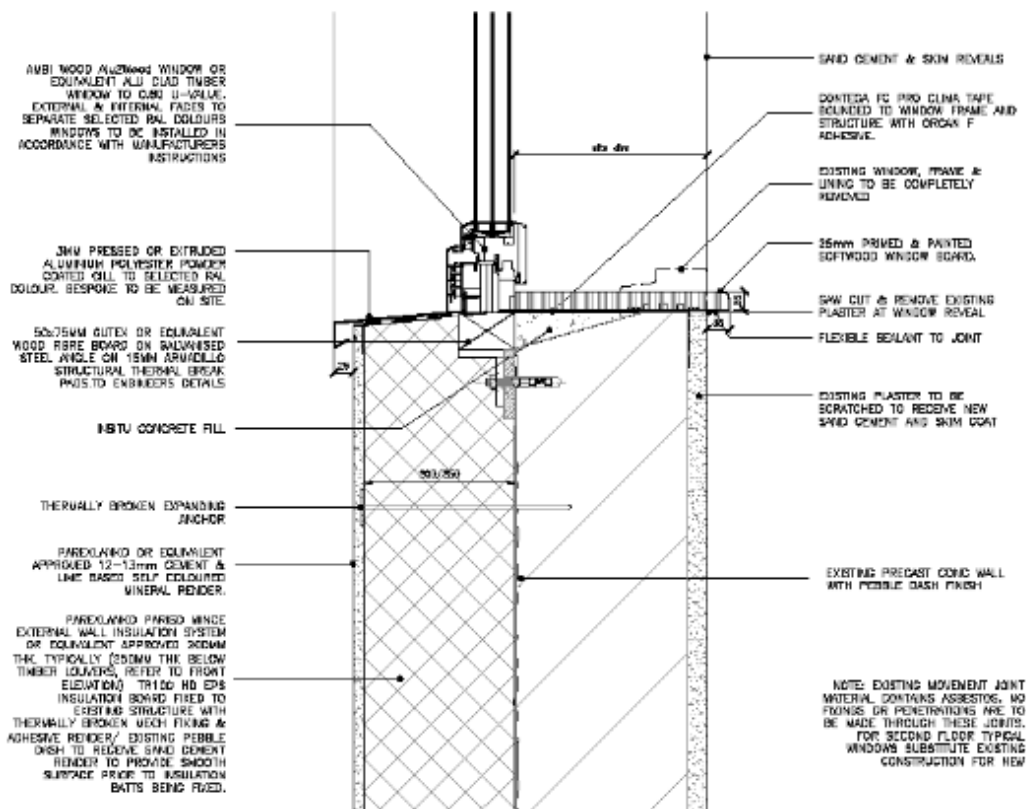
Bottom window detail on the existing building(not to scale)[DRL Co.Co,2014].
